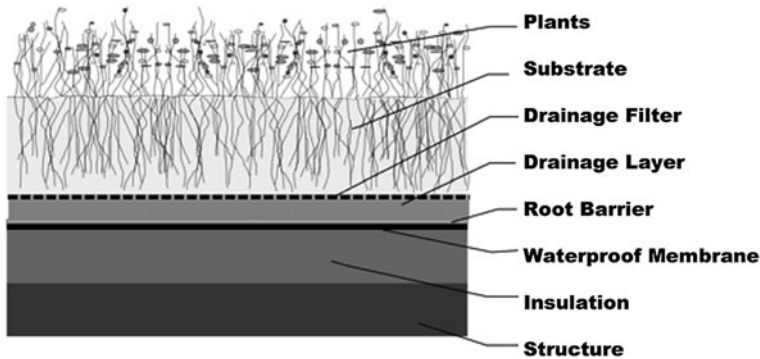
A typical green roof cross-section shown above with its multiple layers
